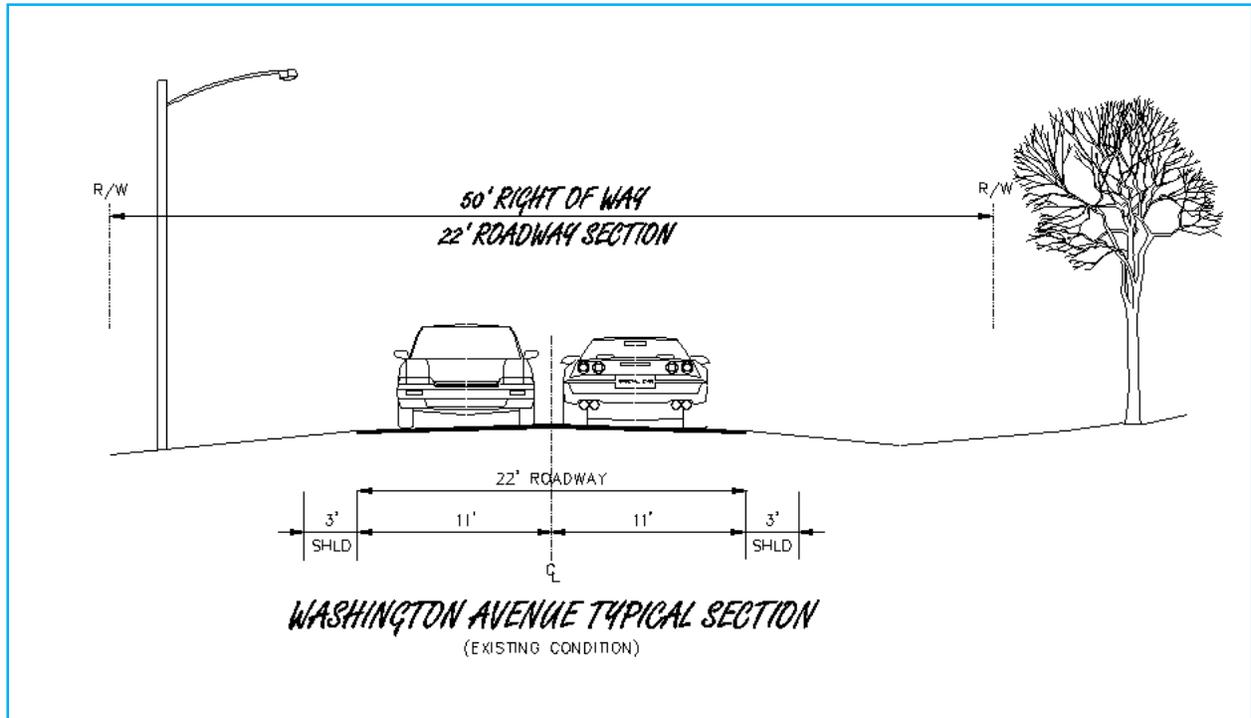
3: WASHINGTON AVE. TYPICAL SECTION – 50’ R/W – 22’ PAVEMENT WIDTH
